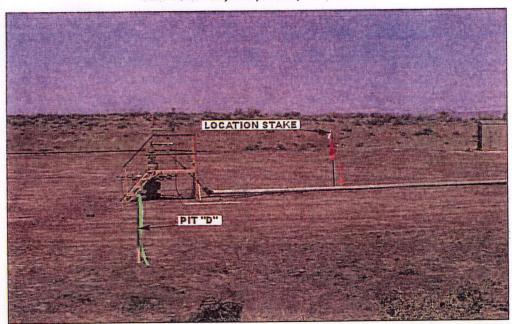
PHOTO: VIEW FROM PIT "D" TO LOCATION STAKE
